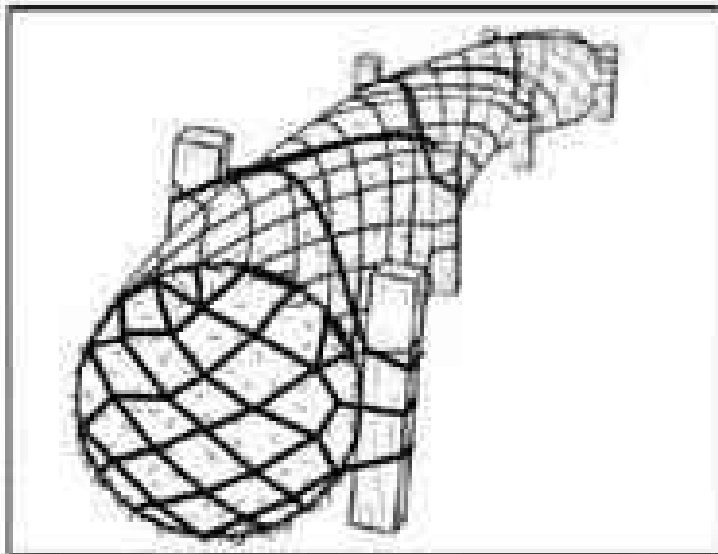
TYPICAL ANCHORAGE OF GEO LOG
